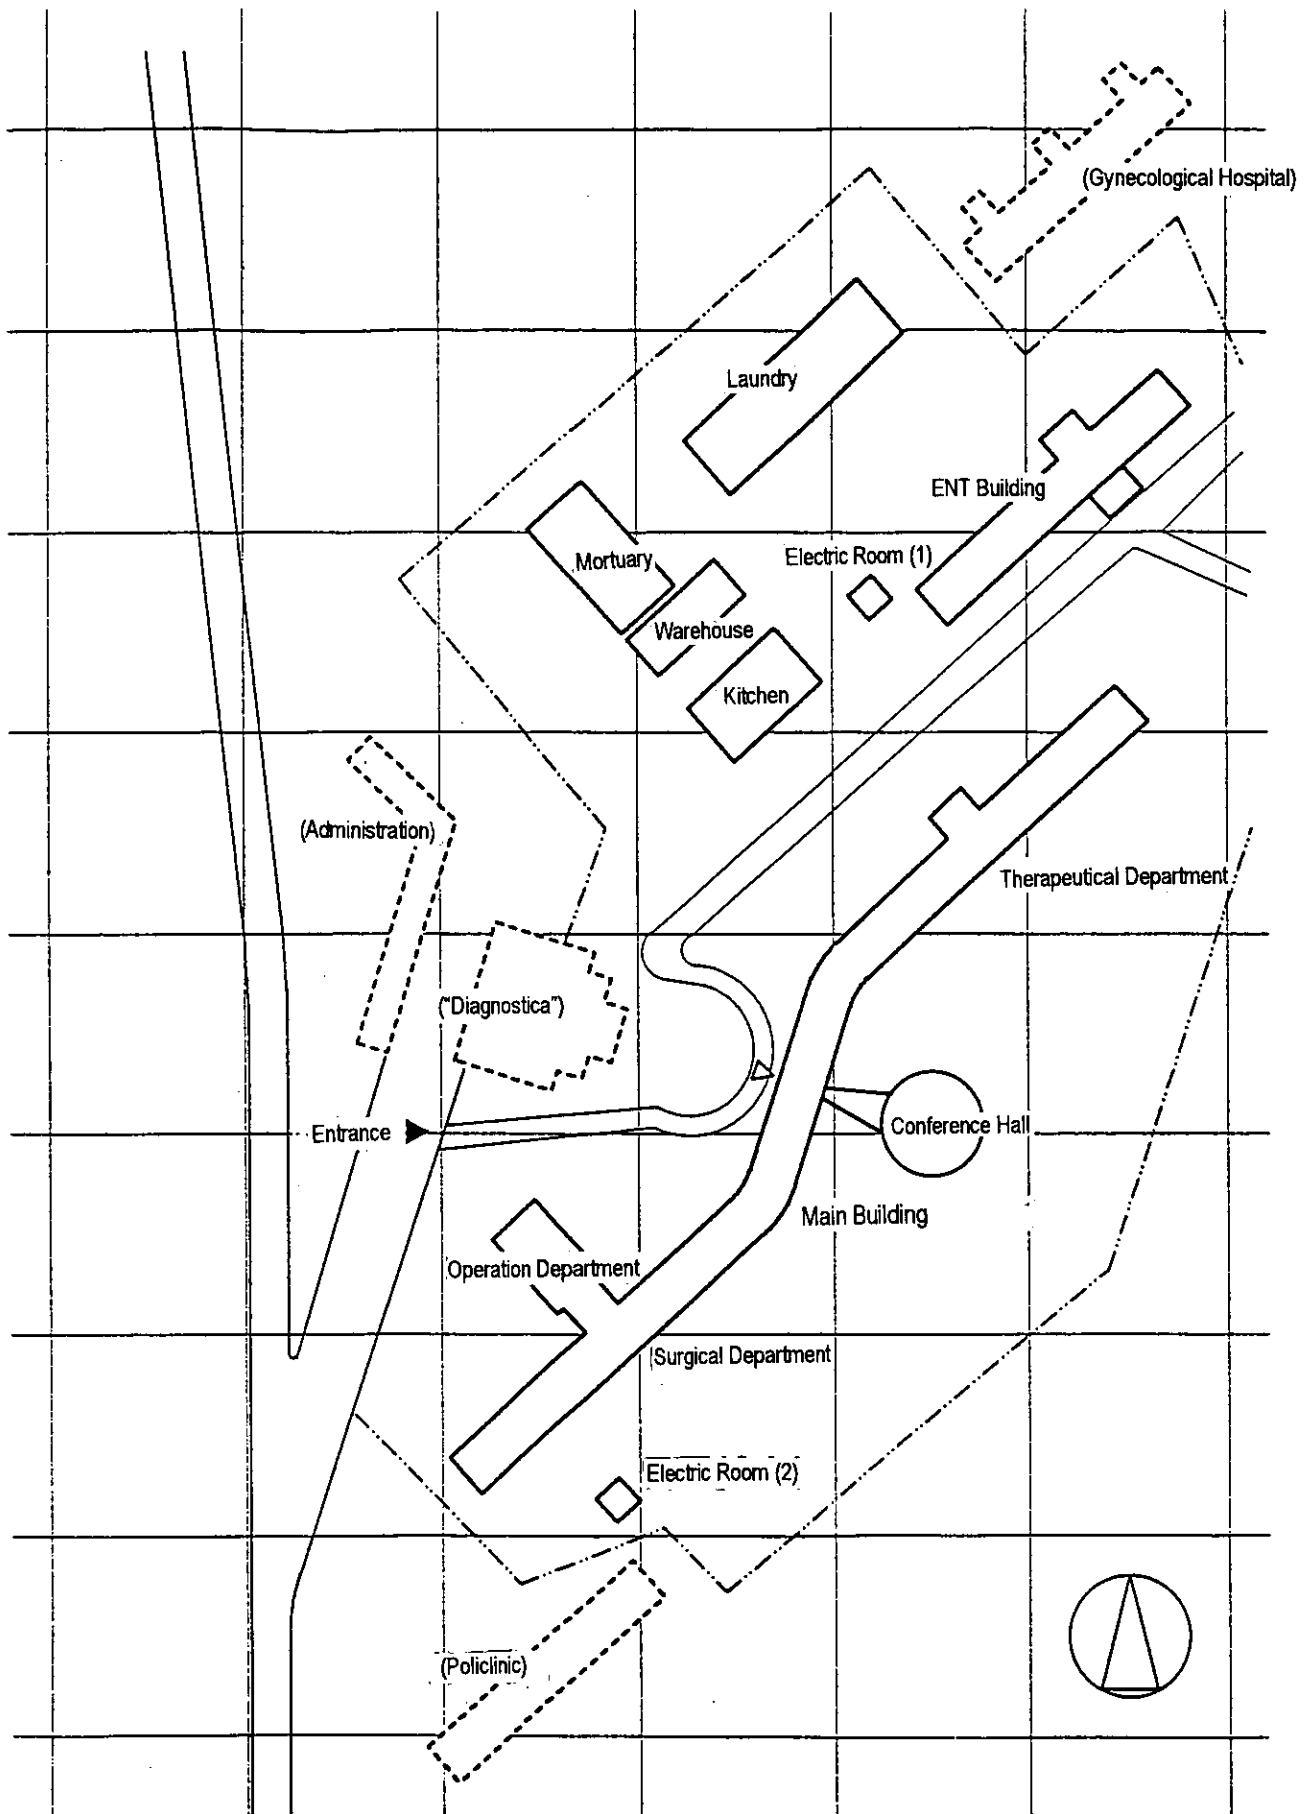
Layout Plan of Republic Medical Center "Armenia" 0 50m 100m
